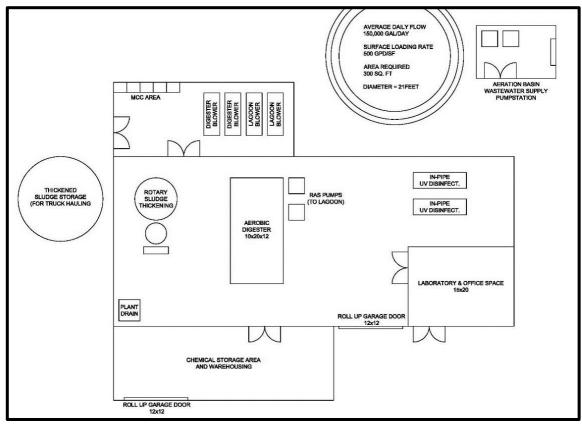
Conceptual Building Layout for Alternative 4 - Extended Air Activated Sludge Process
